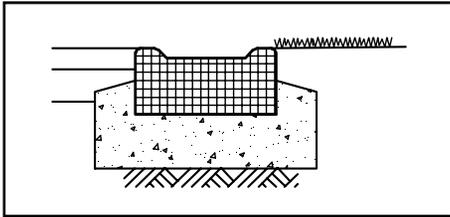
Open gutter made of concrete or polyester concrete
